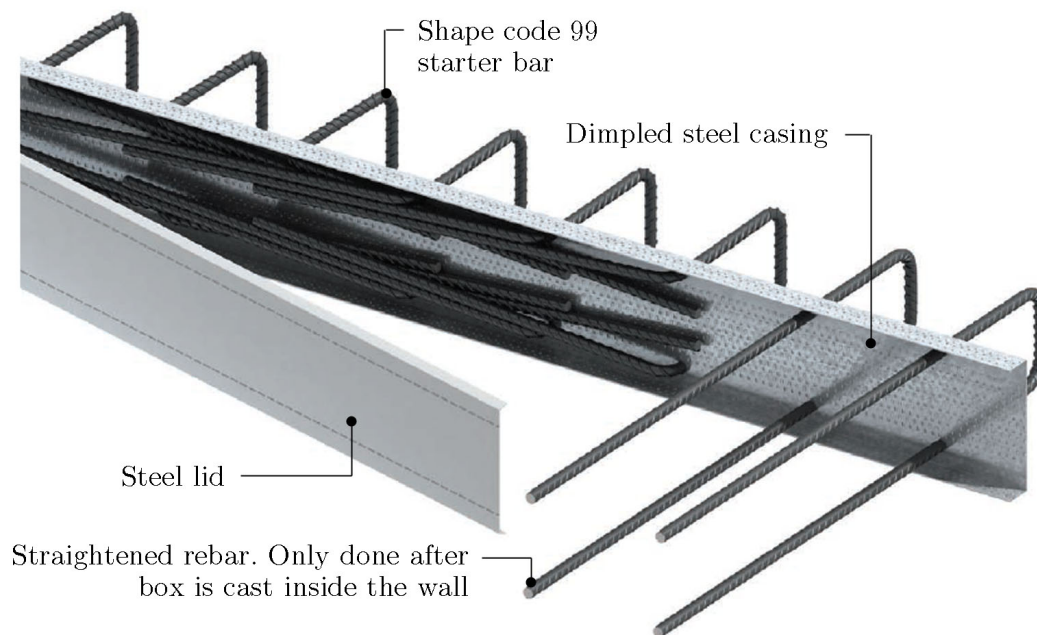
Bend-out Starter-bar Unit (reworked from Ancon Building Products (2011))
